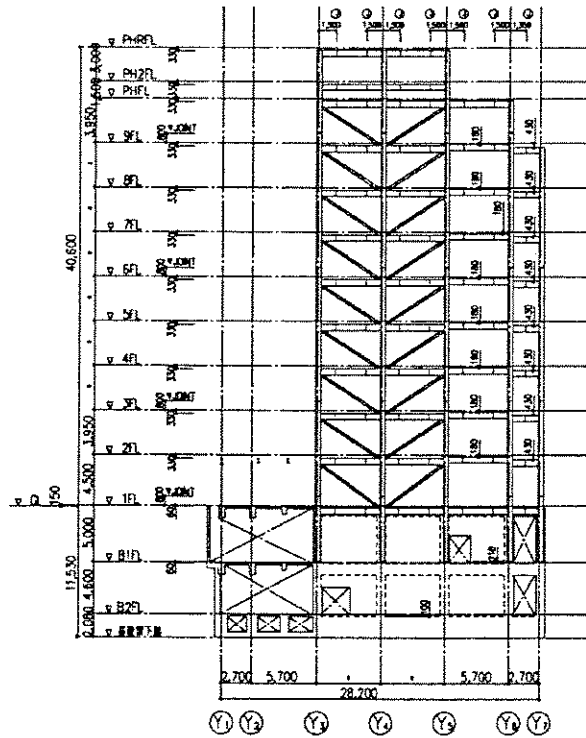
X₆ and X₈ cross sections of model building (courtesy of KKE)
